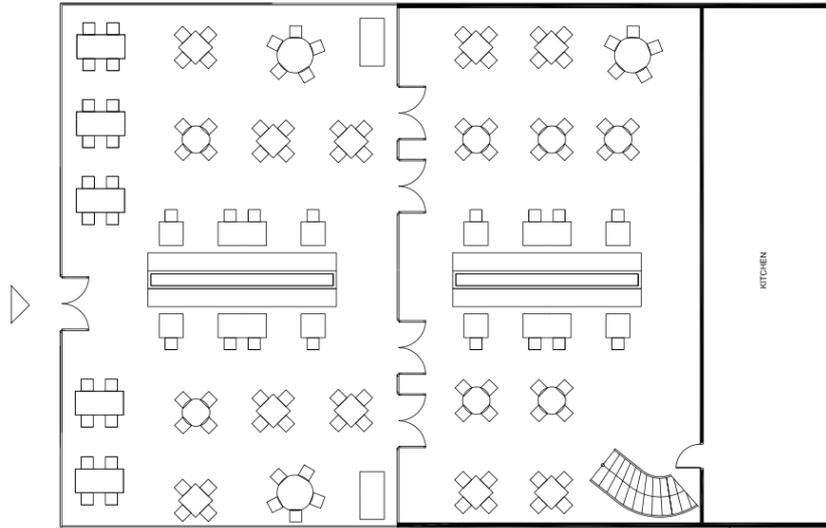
Layout plan of Lou Café & Bistro, Maidan (Drawing by Tilbe Korucuoğlu)
